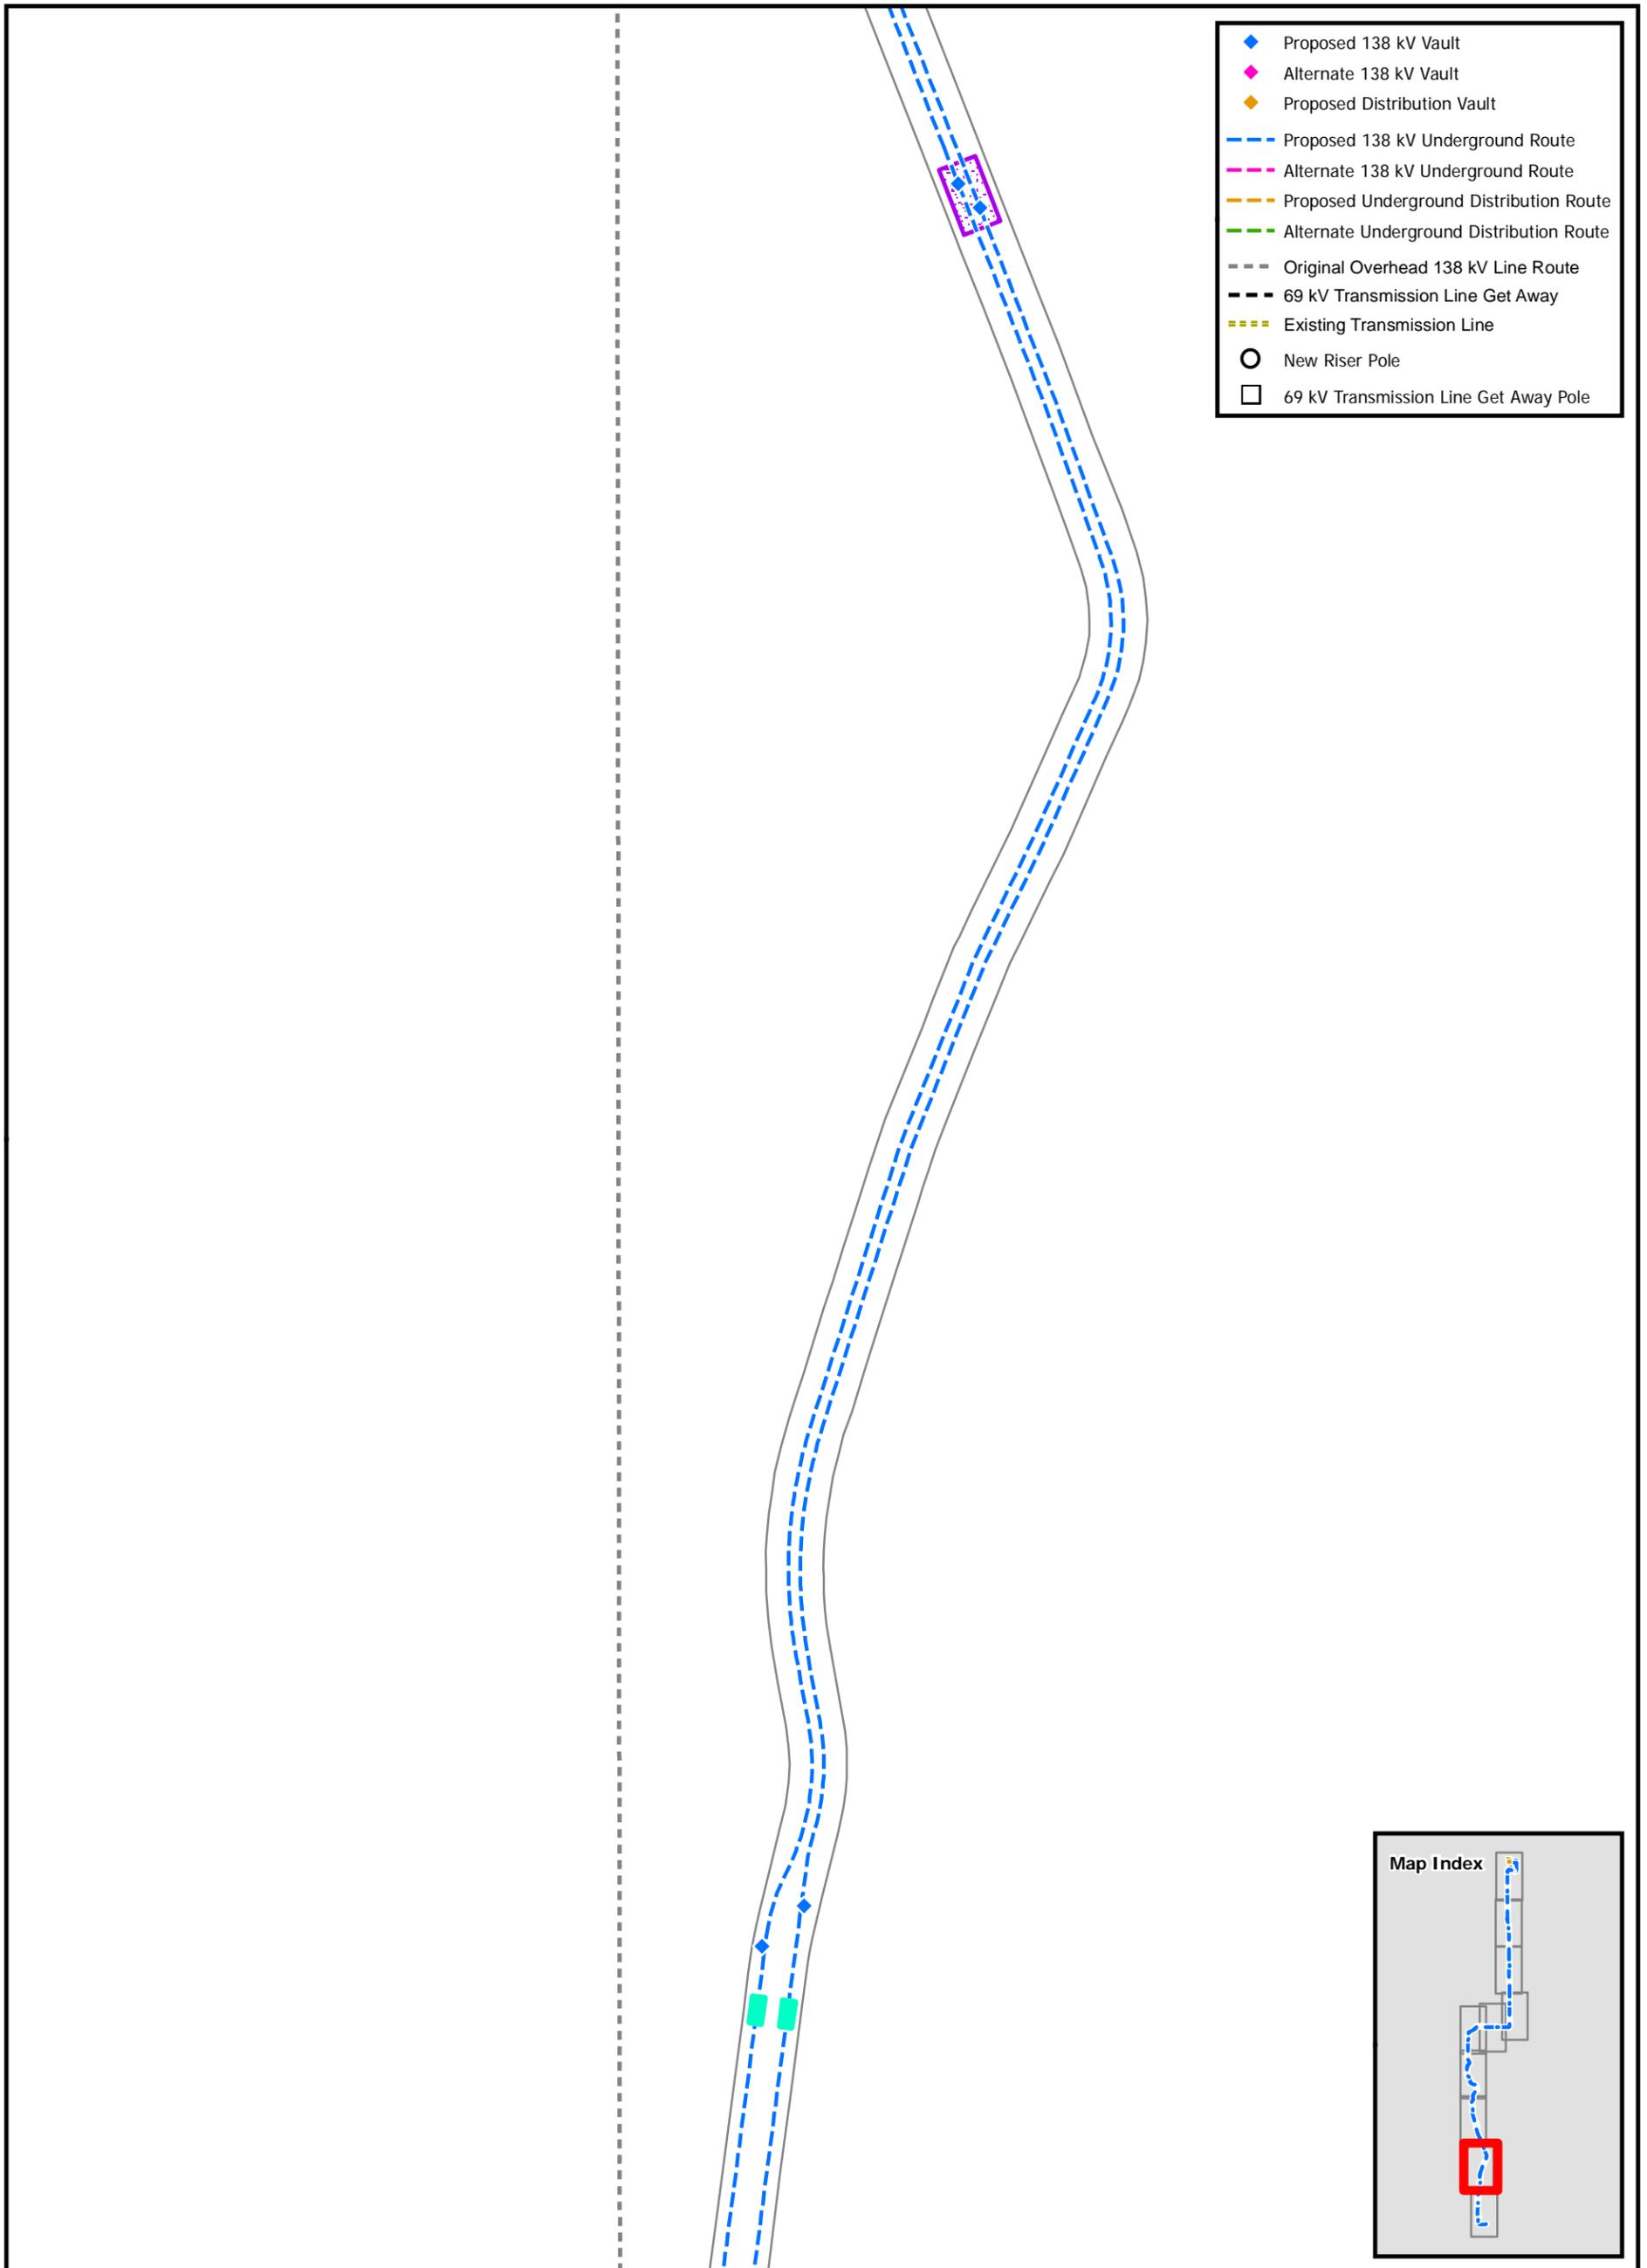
Preliminary Underground Alignment Drawing 9 of 10
